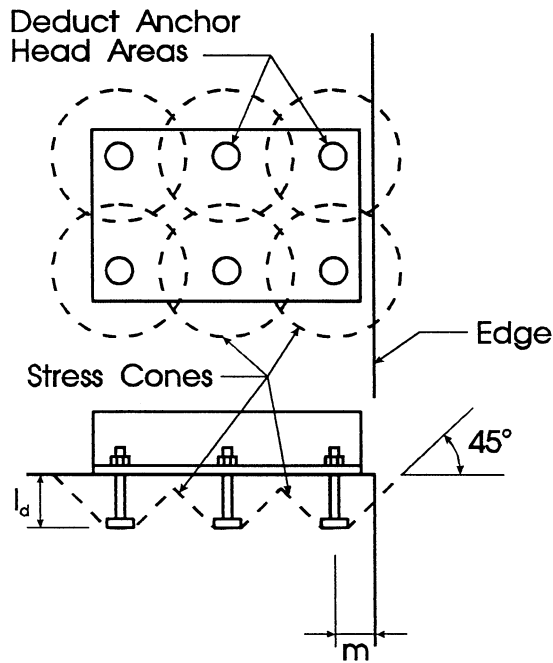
Failure cone for embedded anchor bolts (adapted from ACI 349, 1978)
